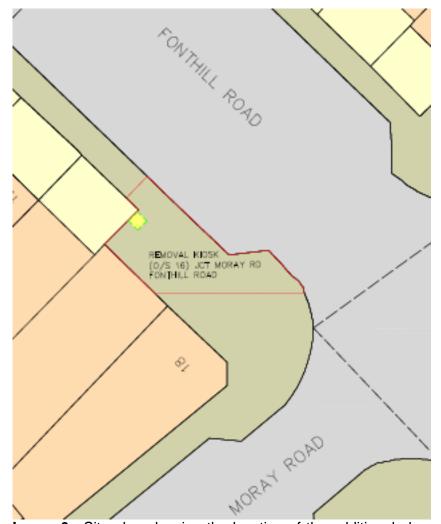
Site plan showing the location of the additional phone box which would be removed prior to commencement of the works.
